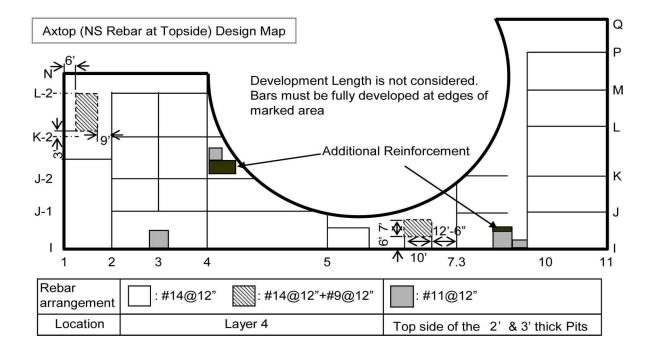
(Sheet 3 of 7) Longitudinal Reinforcement Map, Top Side in NS Direction
